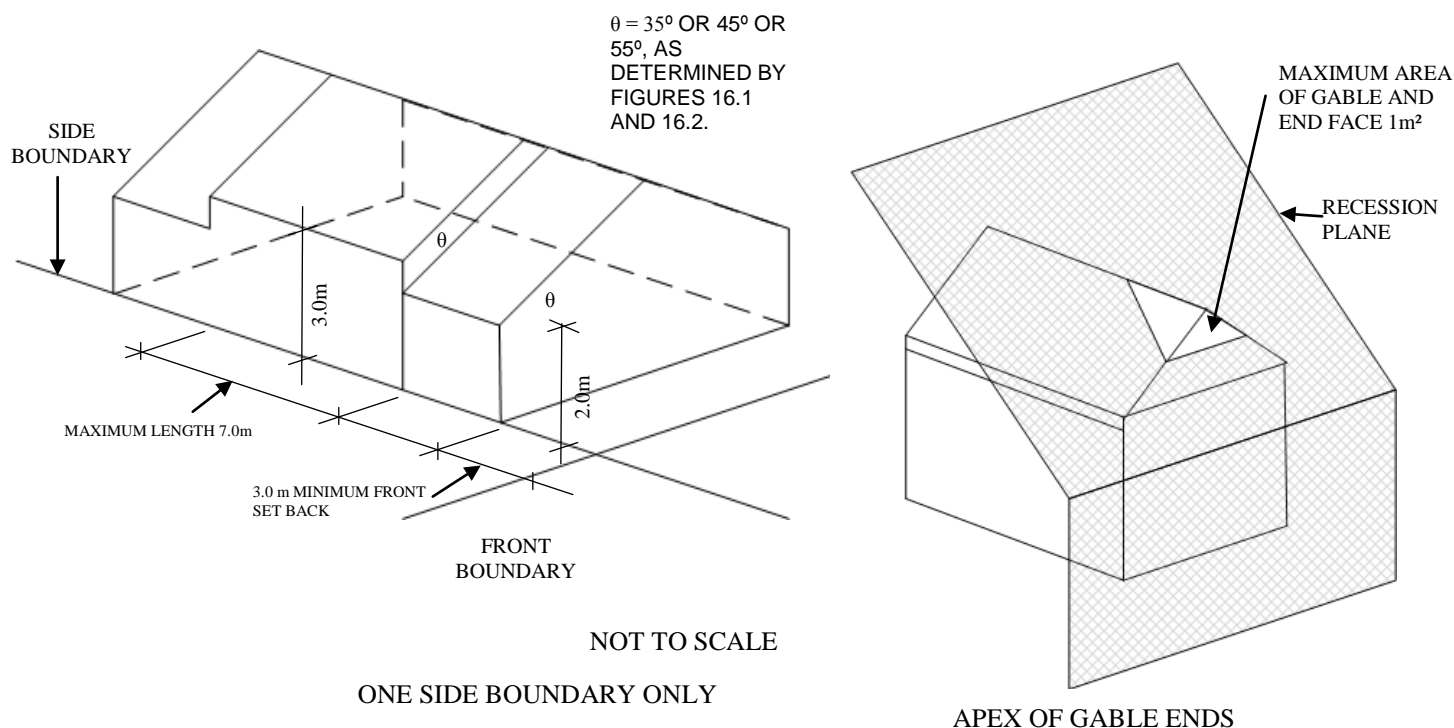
ADDITIONAL ALLOWANCE FOR BUILDING ENVELOPE
